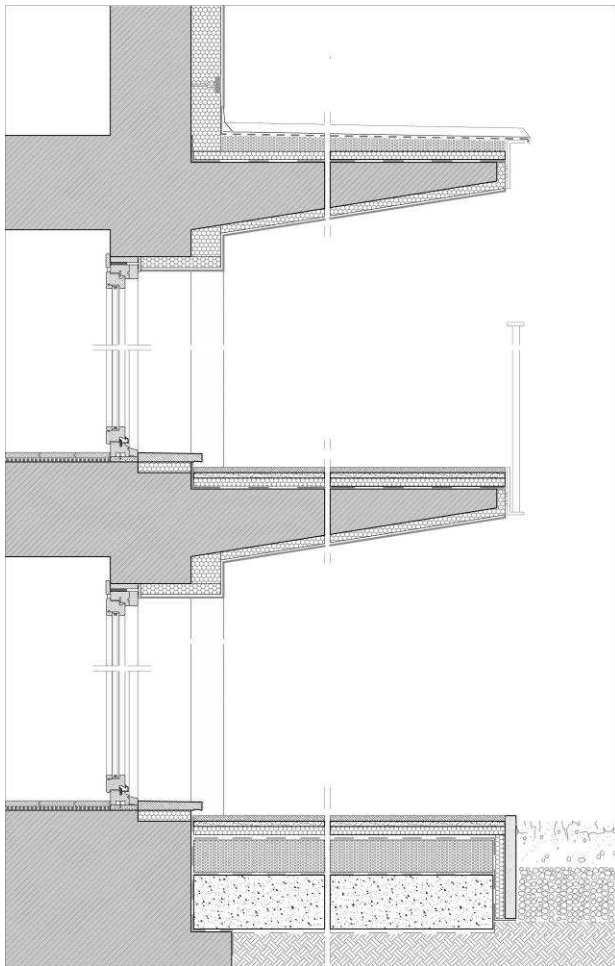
Cross section of the building envelope after interventions following scenario A. The insulating layer has a plastered finishing. New insulated coverings are provided on the windows frames. A double-glazing wooden windows replace the existing ones.
